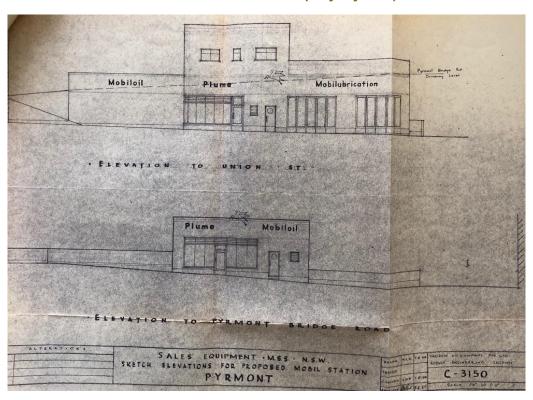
1954 – Elevations submitted as part of DA 804/54, for a new service Station (Source: City of Sydney Archives, DA 804/54, 'Pyrmont Bridge Road & 65/69 Union Street, Pyrmont. Erection of a two level Service Station. Vacuum Oil Company Pty Ltd.')
